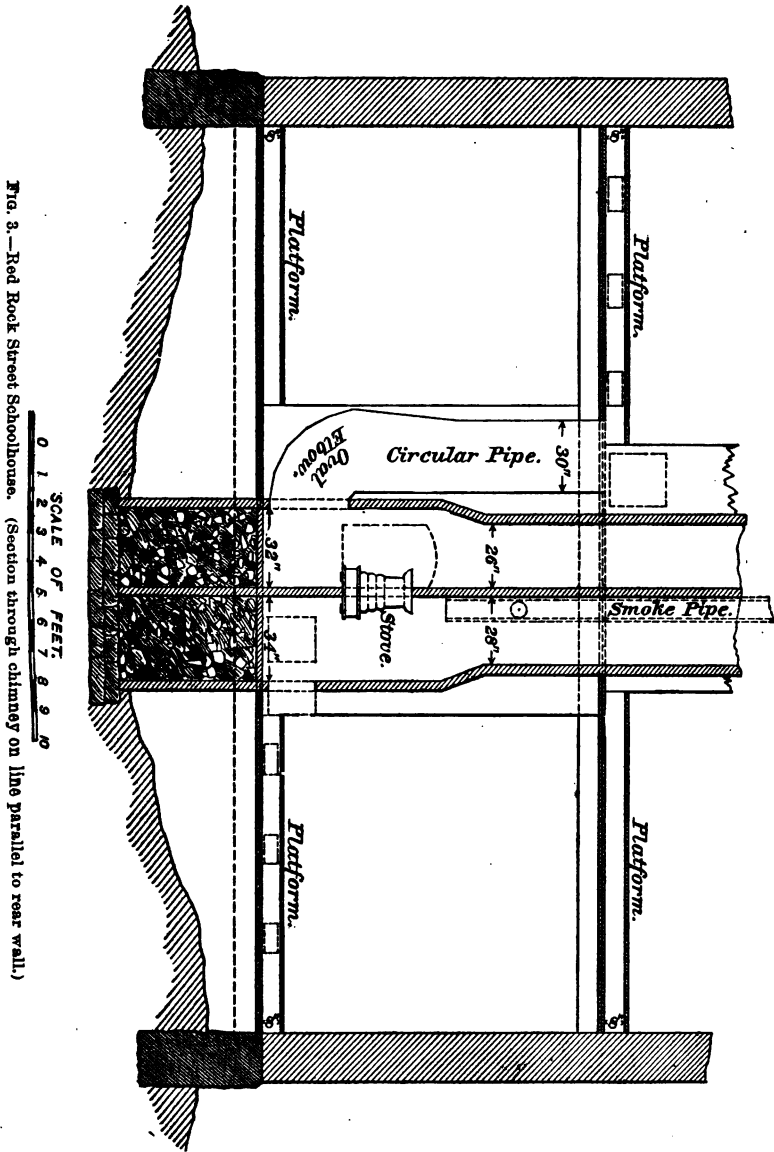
Red Rock Street Schoolhouse. (Section through chimney on line parallel to rear wall.)
